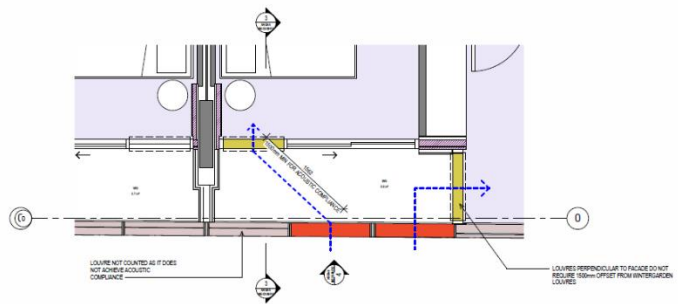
Natural ventilation - acoustic solutions: West, East and South Elevations
